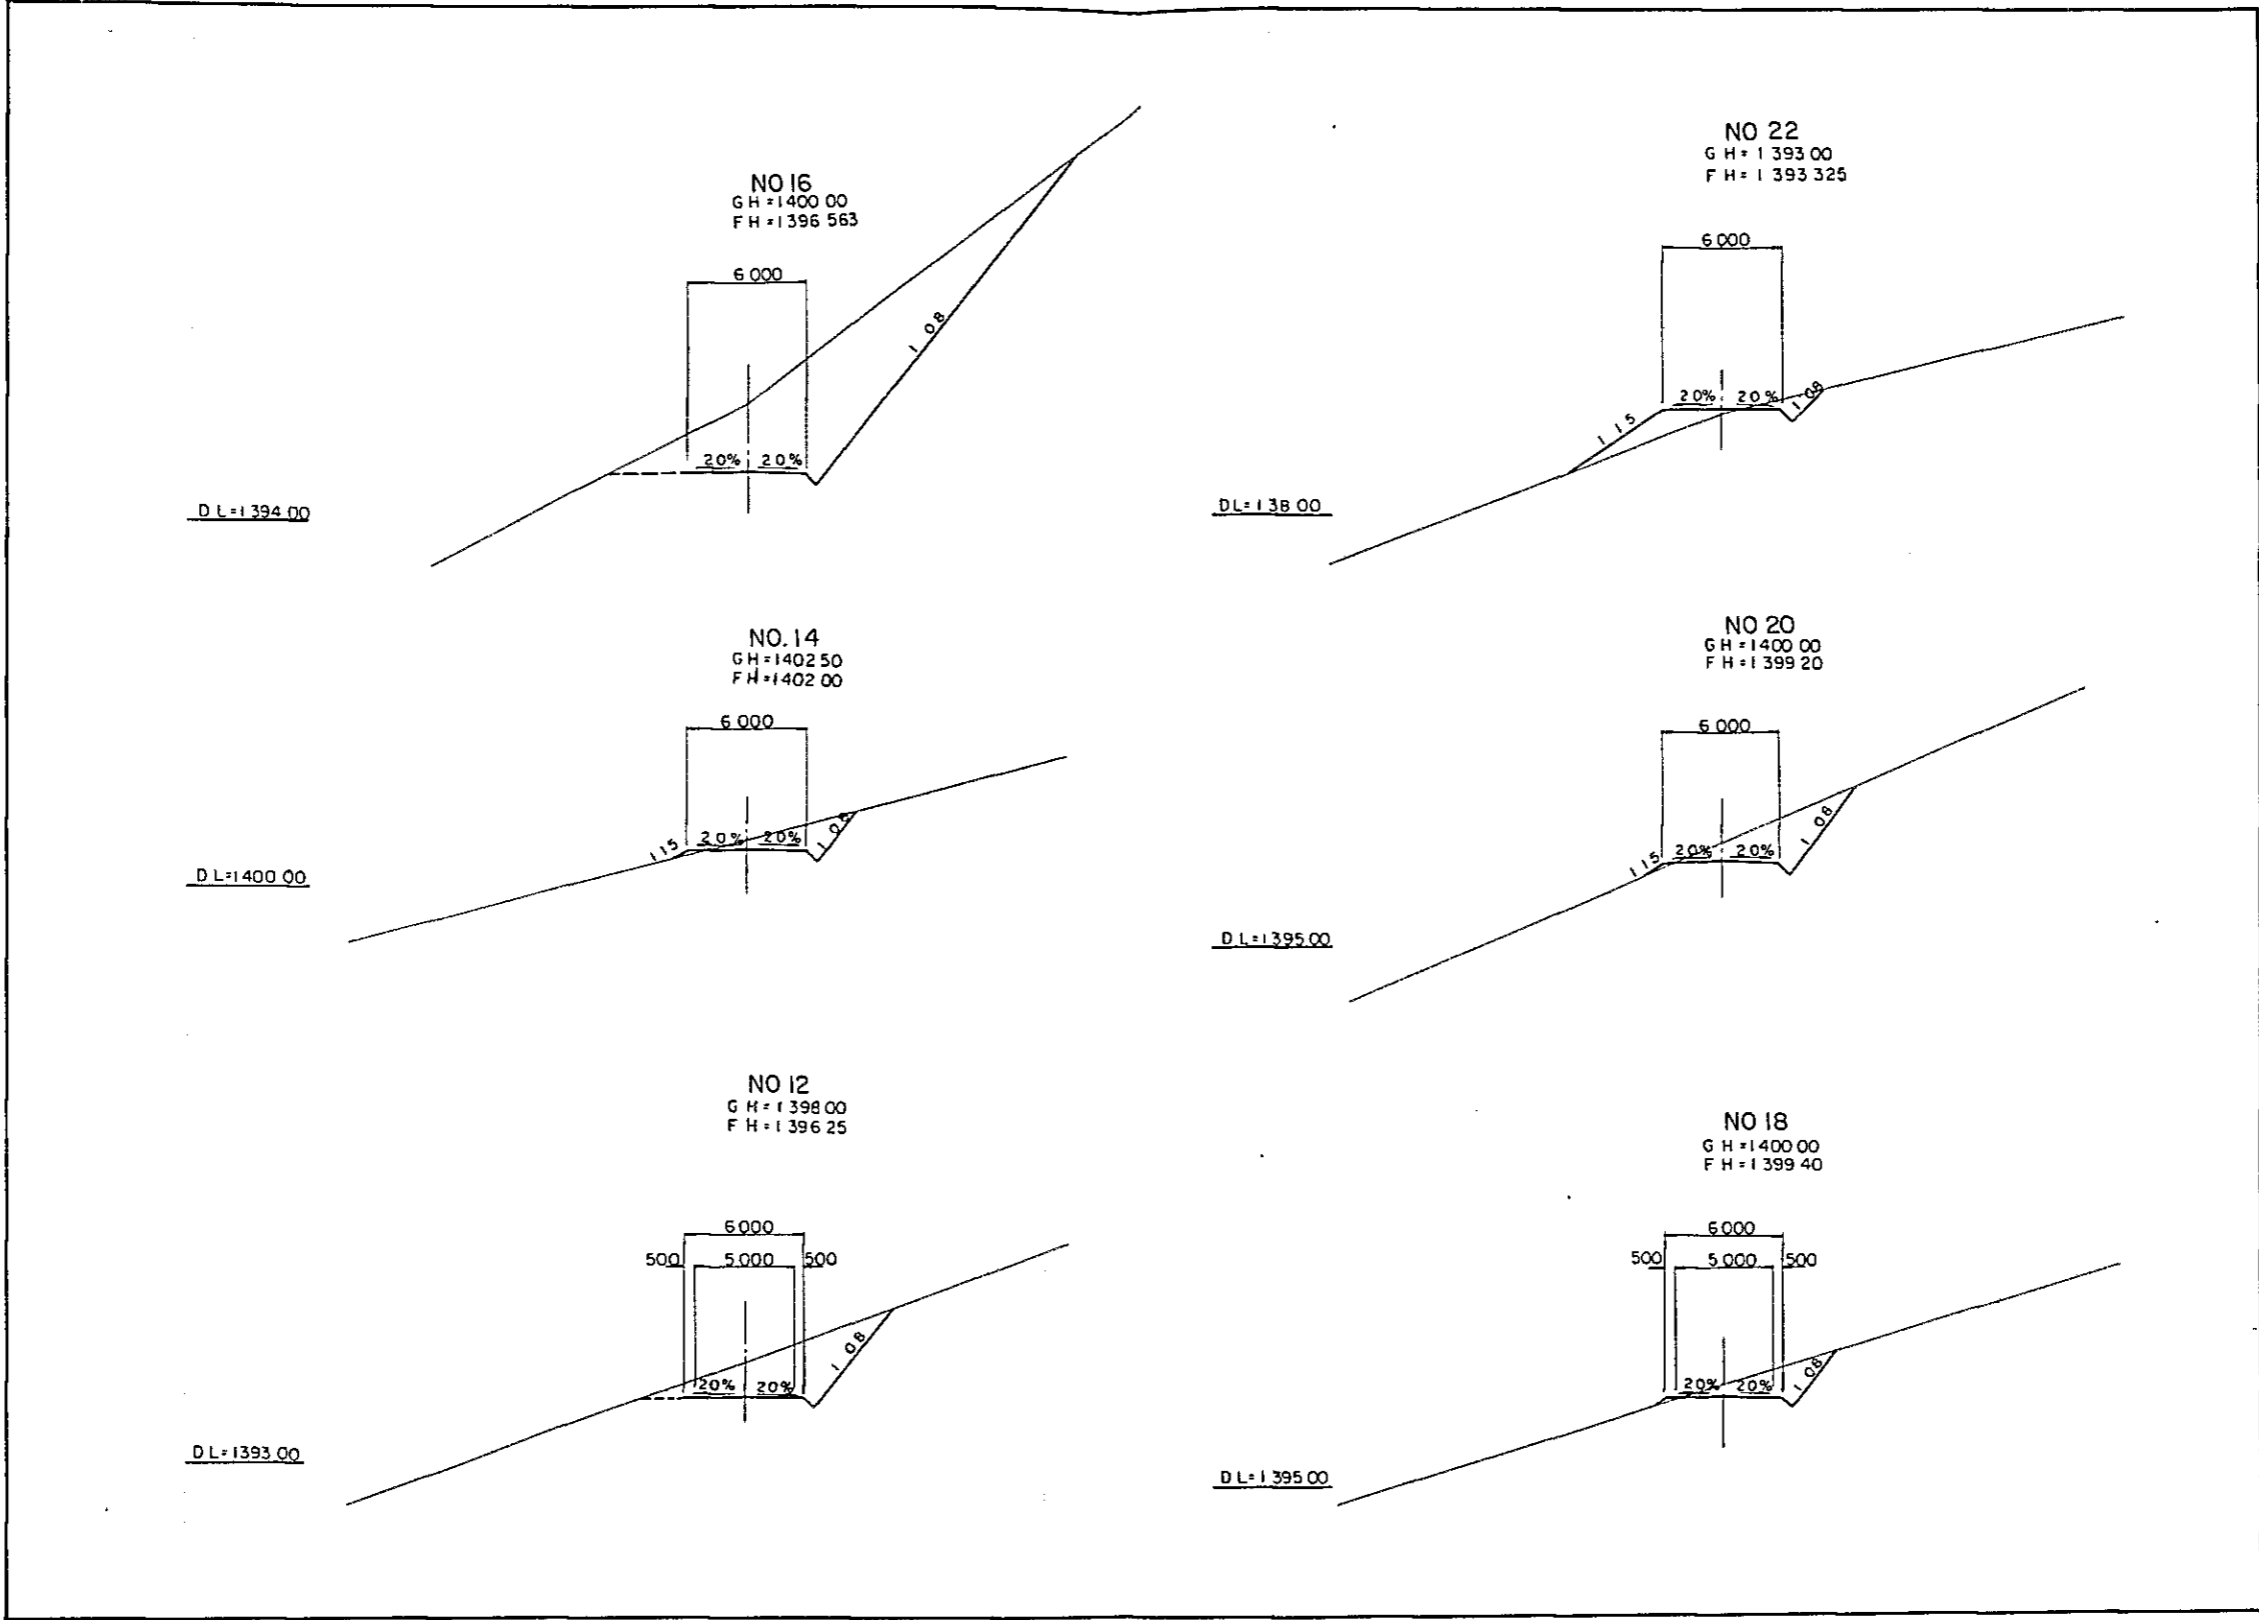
Cross Section of the Proposed Access Road (2)
